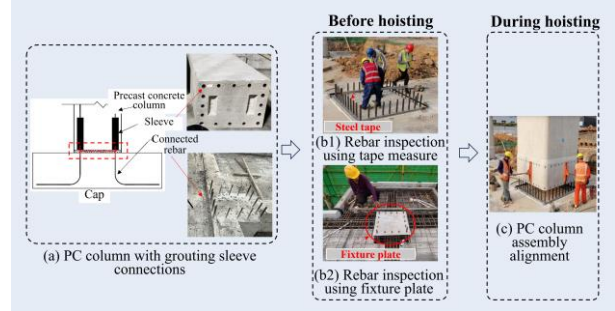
Typical grouted-sleeve connection and on-site alignment inspection stages in PC column assembly
